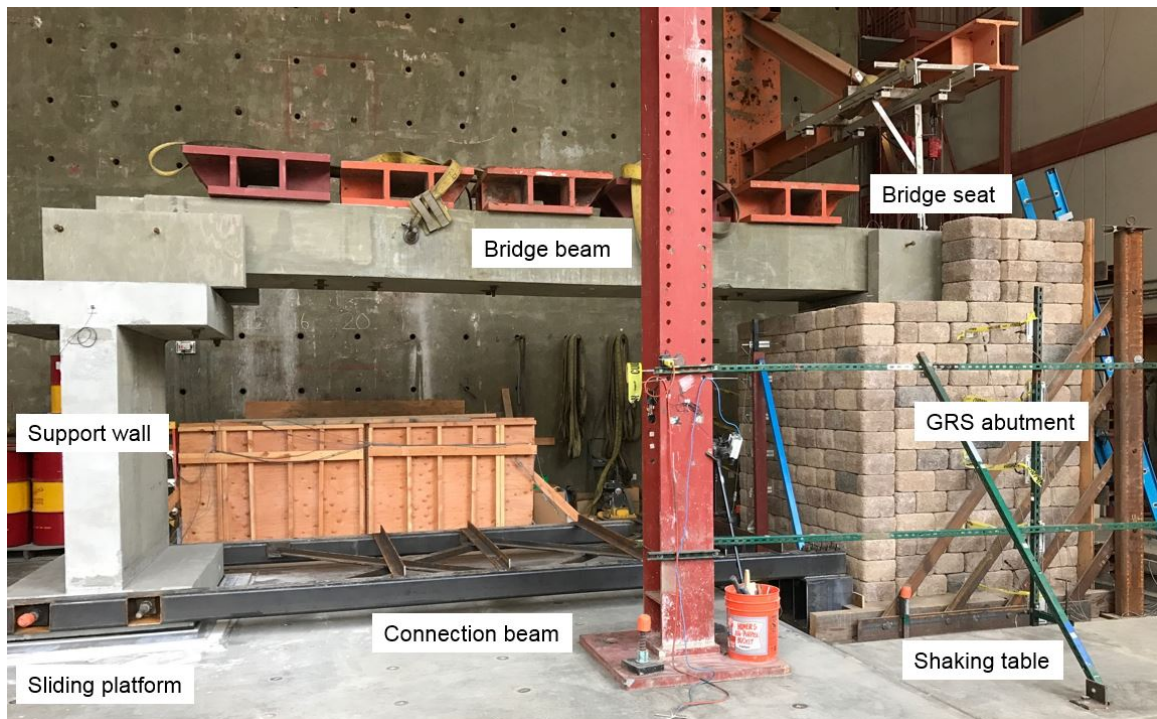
Shaking table test configuration for bridge system for transverse test.
